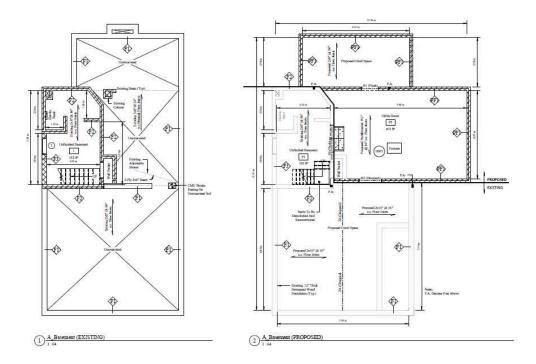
Existing and proposed basement plans, 869 Sangster Avenue. (Images from owners.)
